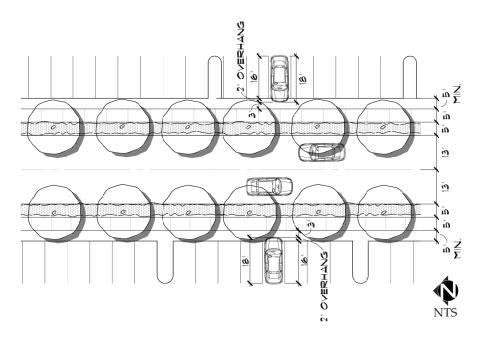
Via Asti - Middle Section (North of Via Villagio) Private Streetscape Section and Plan
